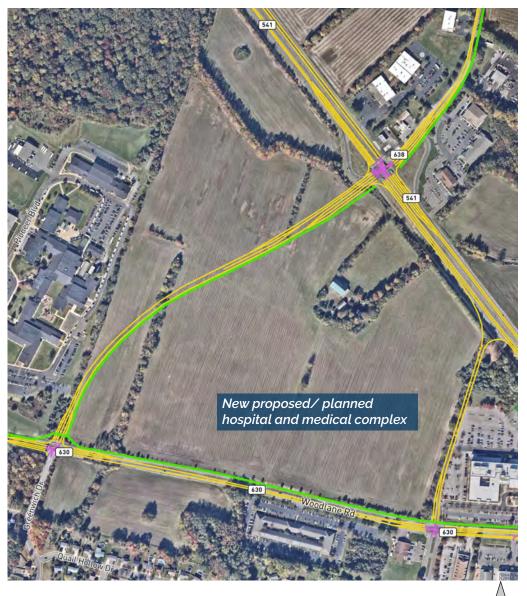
Proposed Improvements at CR 541 and Burrs Road
